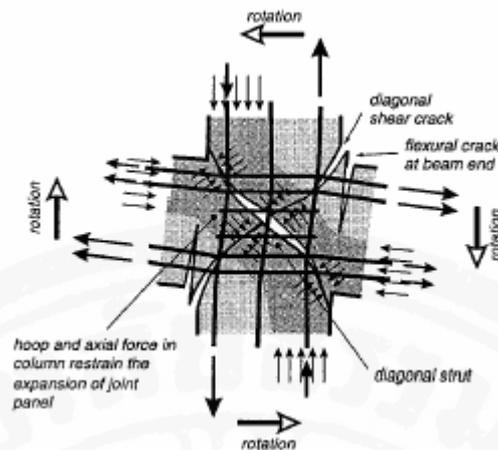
Behavior model for joint shear failure and force flow in beam-column connection (Source: Shiohara, 2001)
